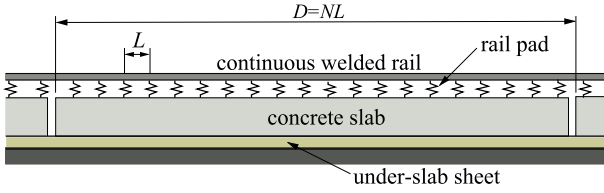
Track with discontinuous slabs supported by under-slab sheet
